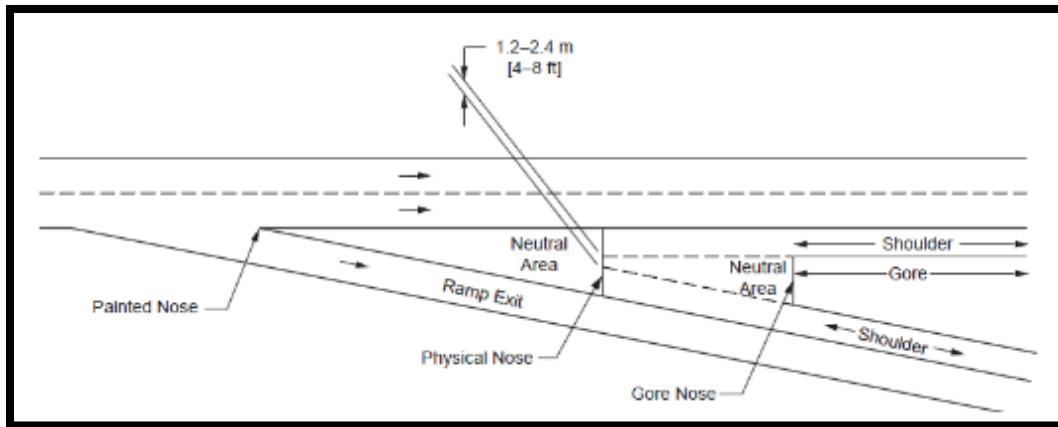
Geometric Layout Example of a Typical Exit Gore Area (Reference: HSM, 2010).
